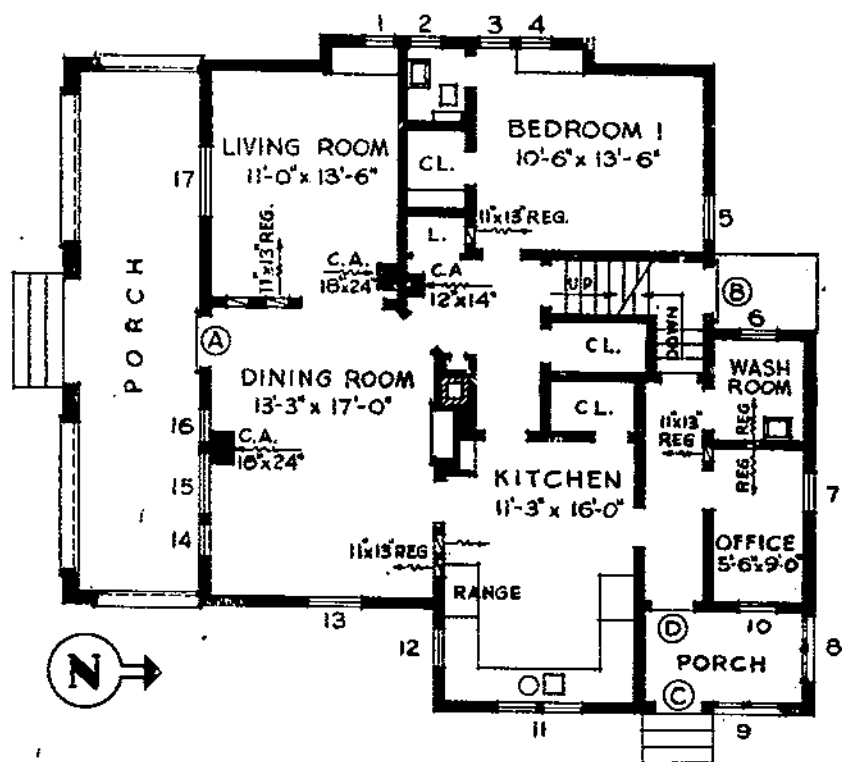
First-floor plan of house No. 1-R, showing changes.
